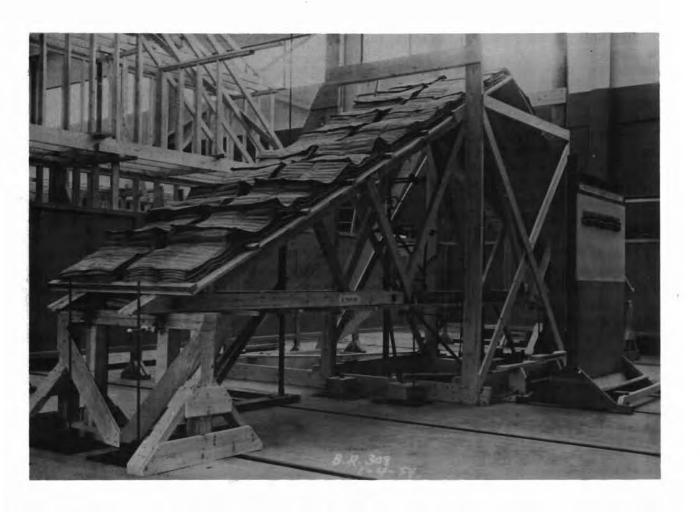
Trusses loaded with ceiling load (10# per square foot) plus dead load (shingles = 2.1# per square foot) and design live load (snow load = 50.8# per square foot of horizontally projected roof area). Note deflection board and wire and pulley arrangement for recording deflections.
